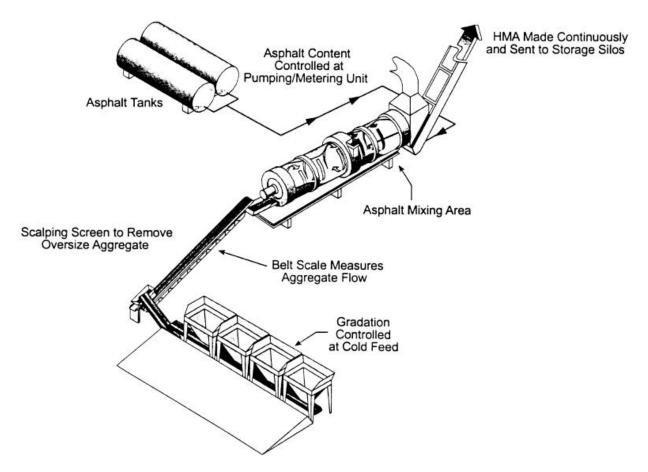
Flow of material through a drum-mix plant (continuous-flow facility).
